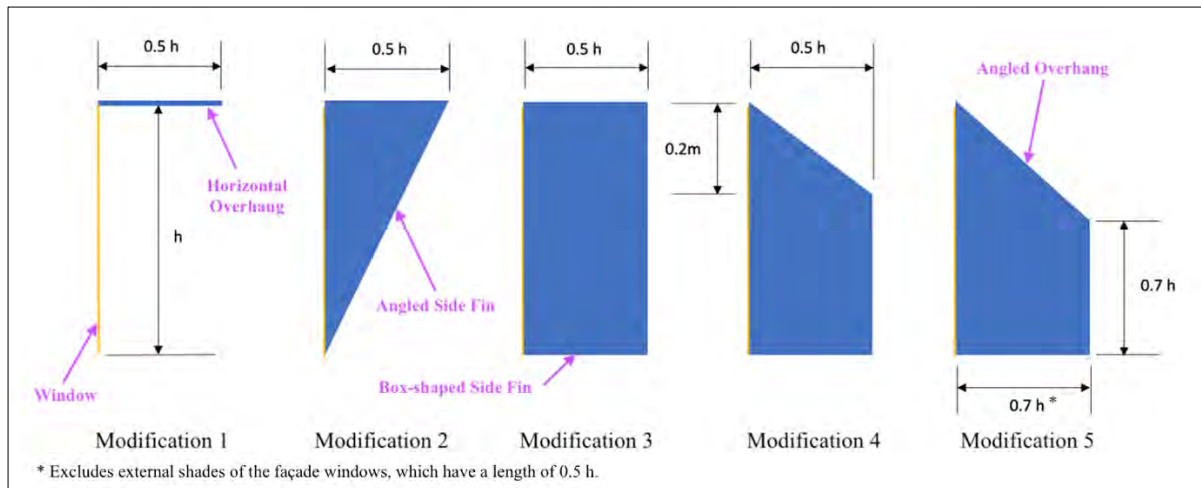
Model Step Modifications of External Shading showing Shading Sectional Views
